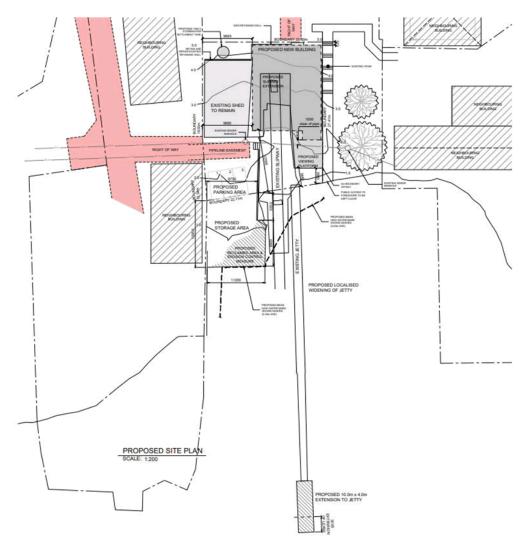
Proposed site layout (the subject site outlined in red). M Fletcher Drawing A001.
